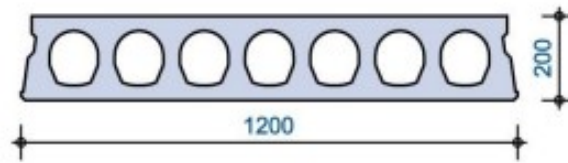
VBI hollow core slab floor element cross-sectional view, dimensions in mm
